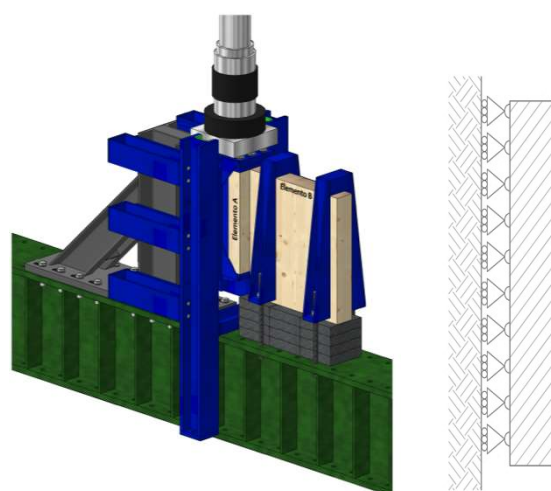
test set-up for timber-to-timber connections tests (left) and set-up schematization
